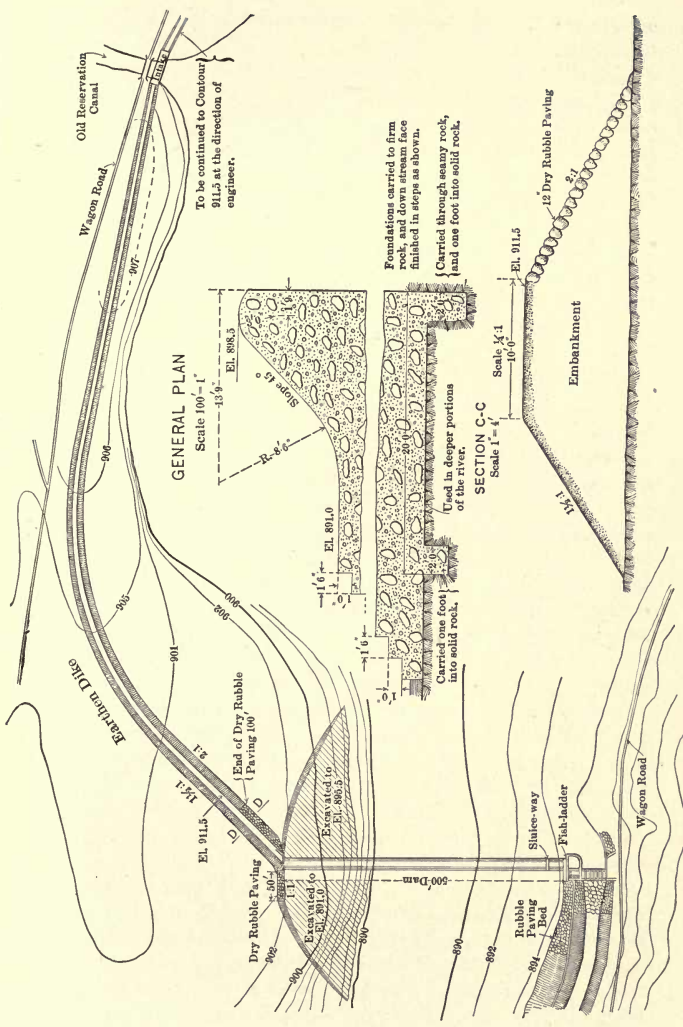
Plan and Sections, Sunnyside Diversion Dam,
